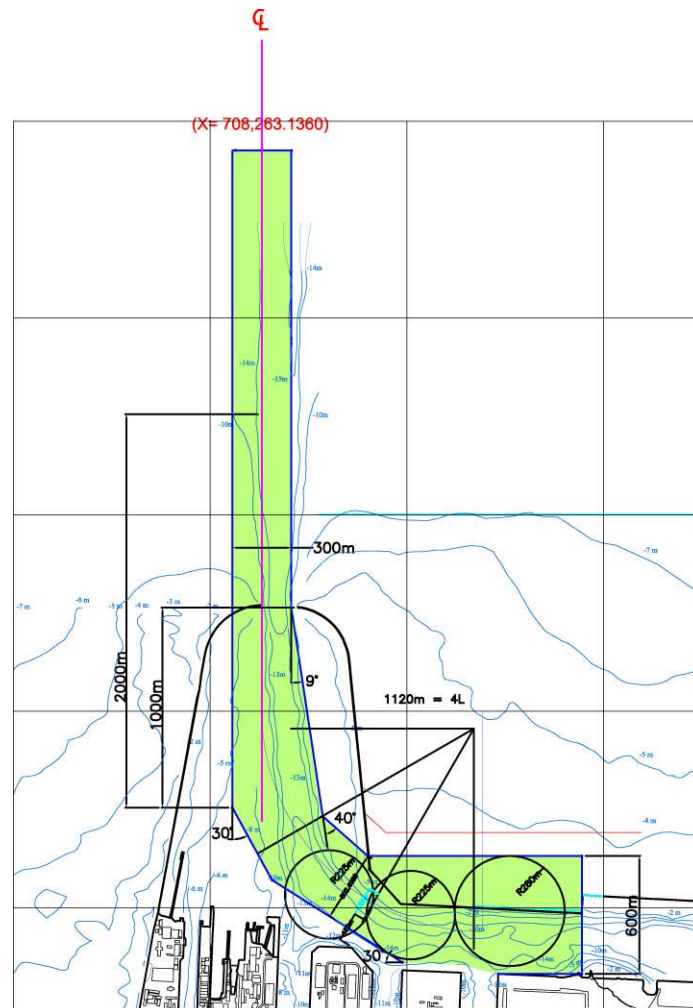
Initial Proposed Navigation Channel and Basin Plan
